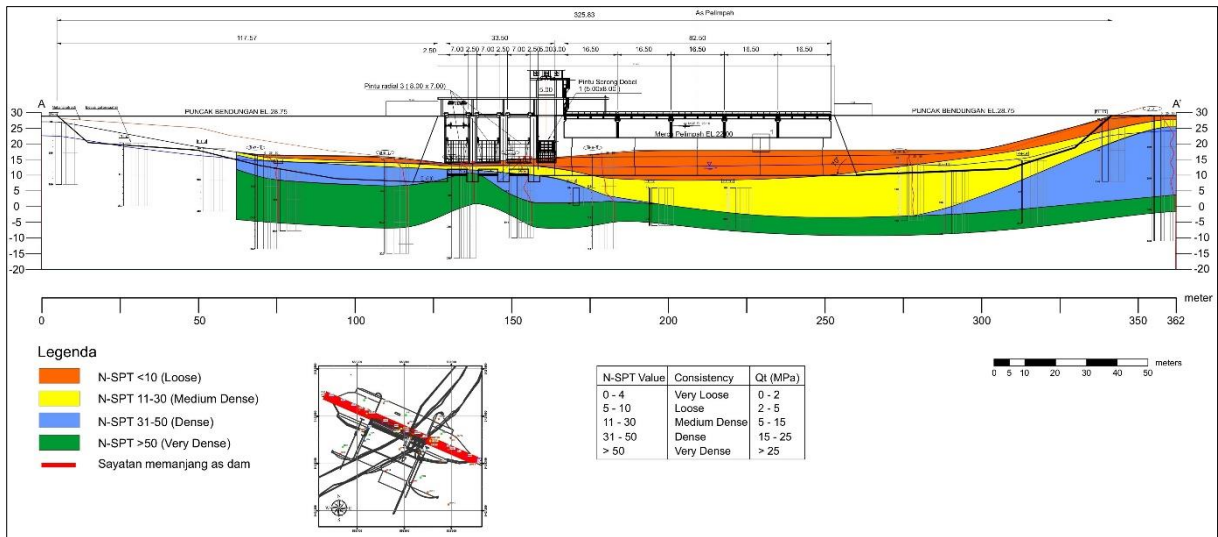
Cross section of Standard Penetration Test (SPT) result at Margatiga Dam Project
